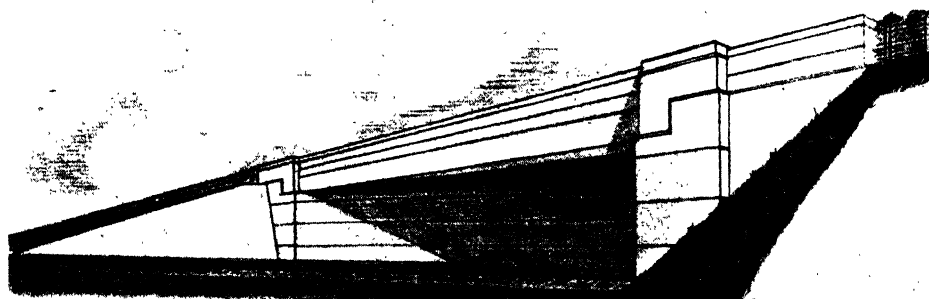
RODBASTON RAILWAY BRIDGE.
